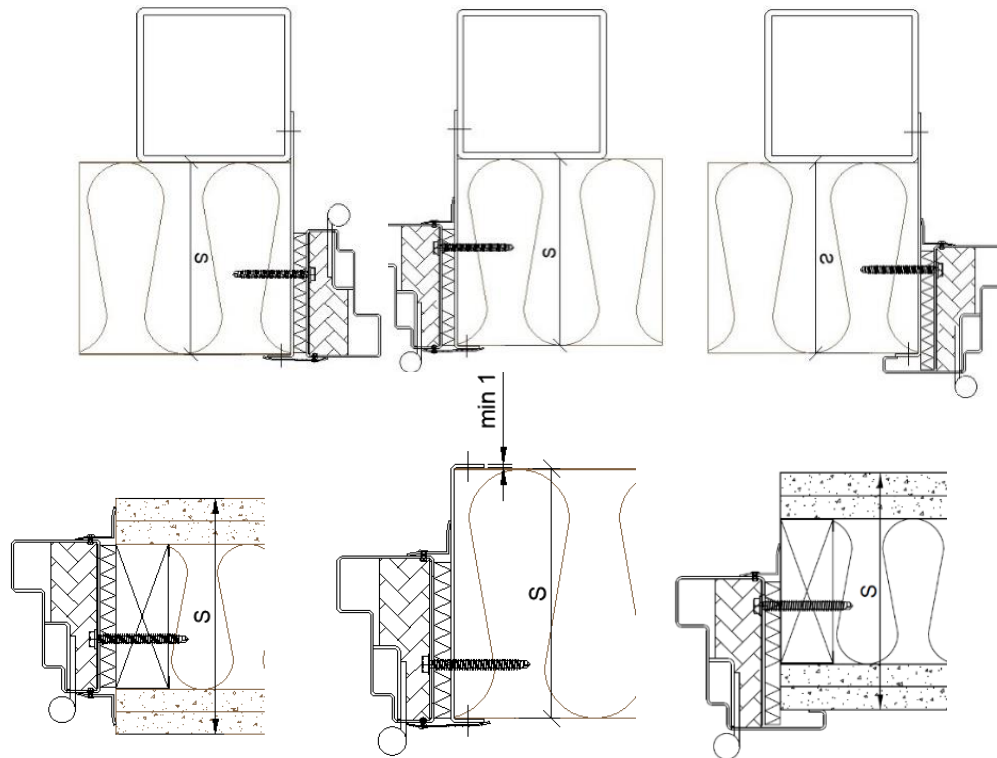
Installation of the door into the structural opening SMU110/210; SMU106/206; SMU107/207
